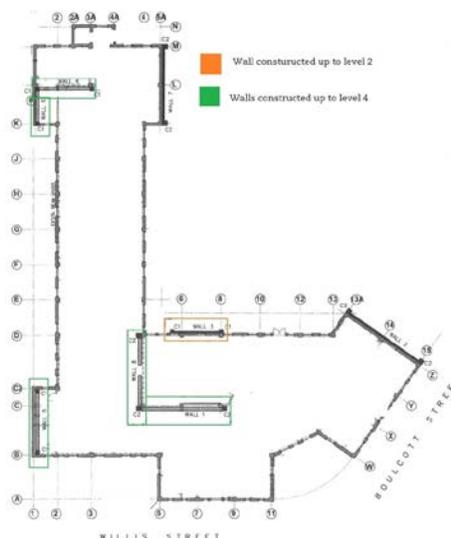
Typical Plan of Partial Seismic Strengthening
